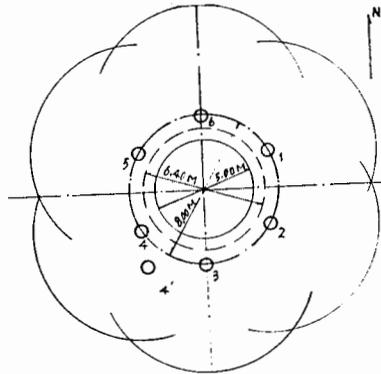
Grout hole pattern and design of an ideal closed curtain wall for central air shaft in Shandong
